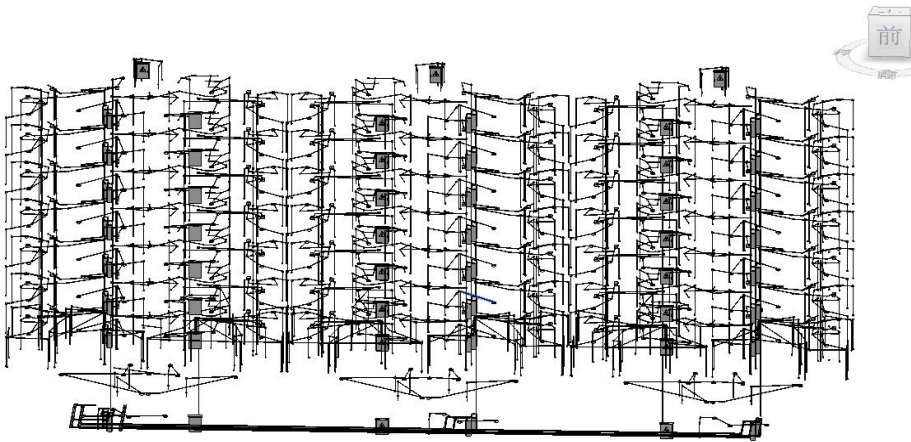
Revit Model of Shenyang Evergrande Times New City Building 6 Installation Project
